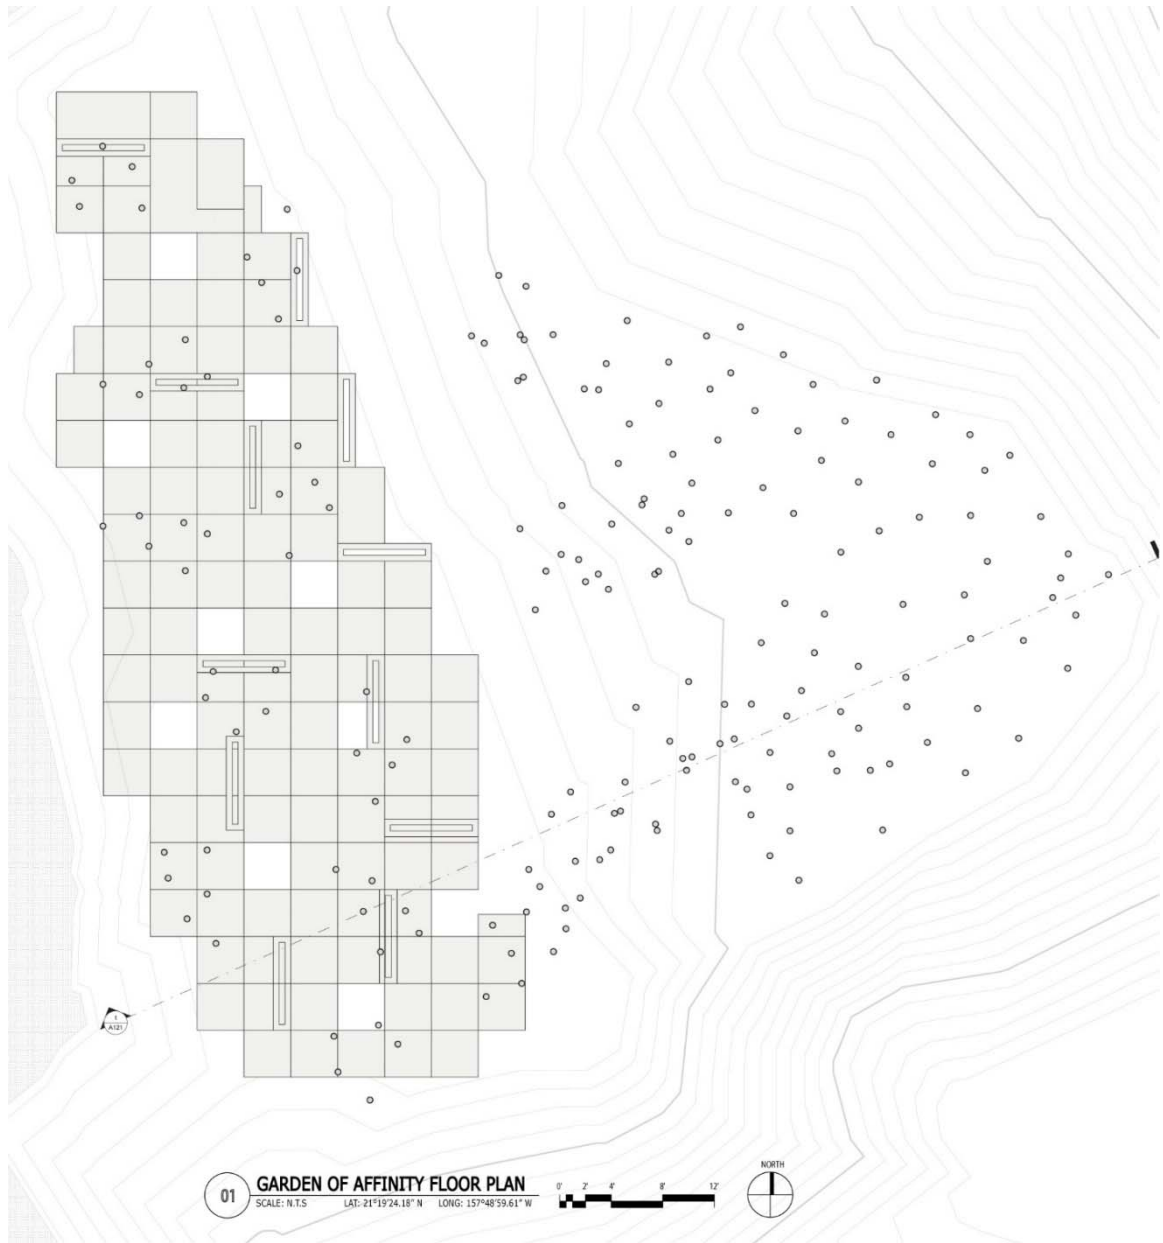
Garden of Affinity Floor Plan. Made by Author.
